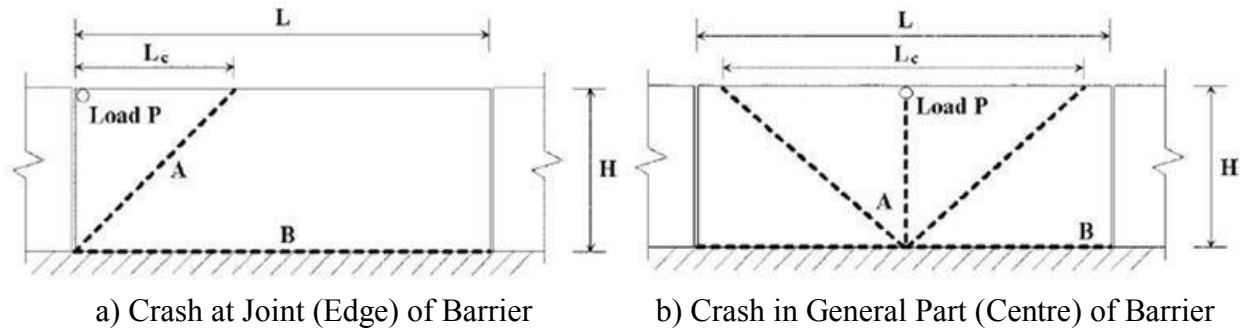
Failure Modes of Precast Barriers without Longitudinal Connection (Jeon 2011)
